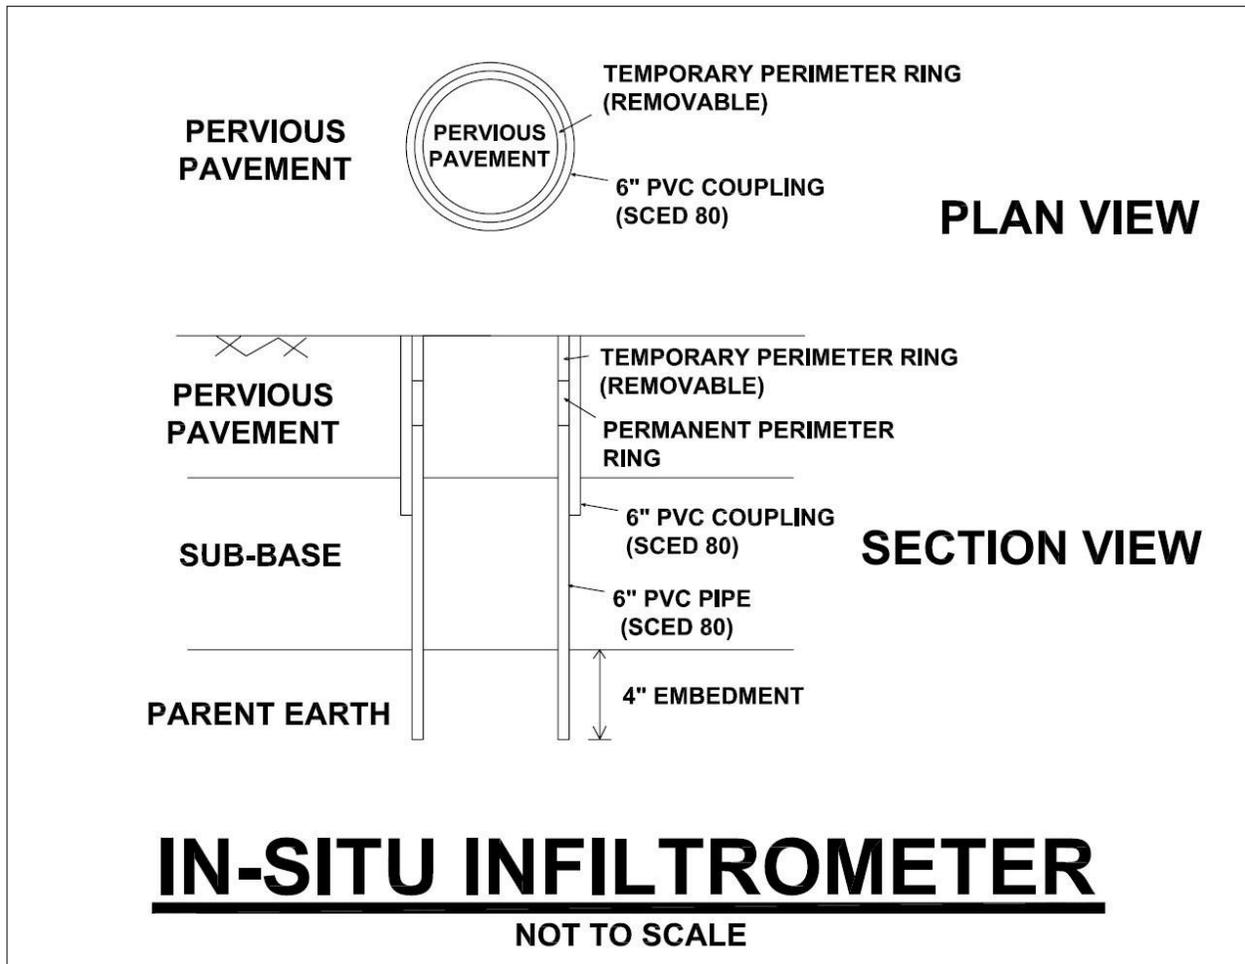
Plan View of ERIK In-Situ Infiltrometer - (Embedded Ring Infiltration Kit).
